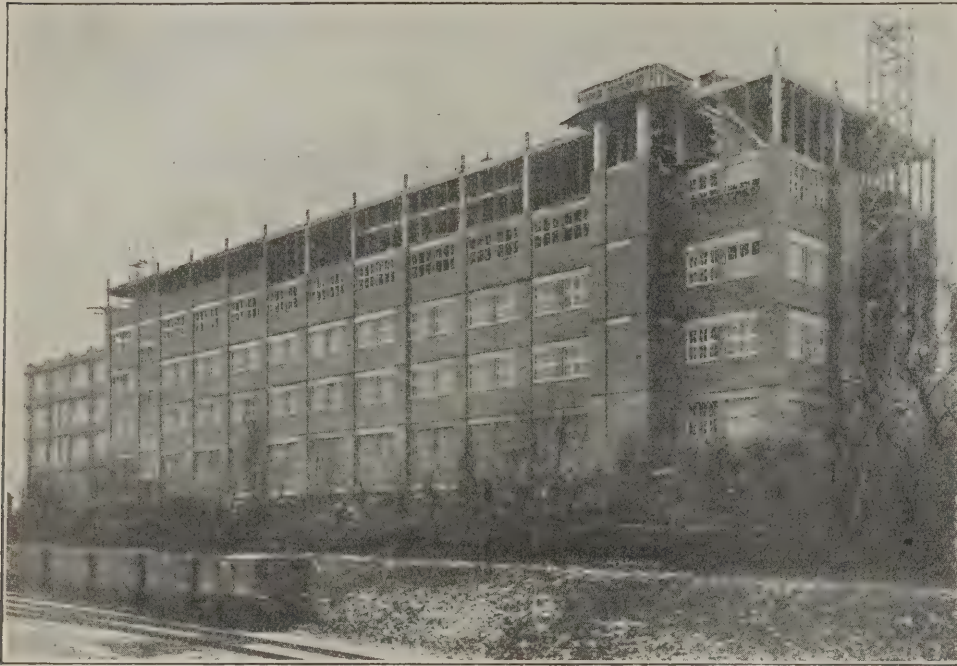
A REINFORCED CONCRETE FACTORY WITH REINFORCED BRICK WALLS AT MESSRS. ROWNTREE & CO.'S WORKS AT YORK.
